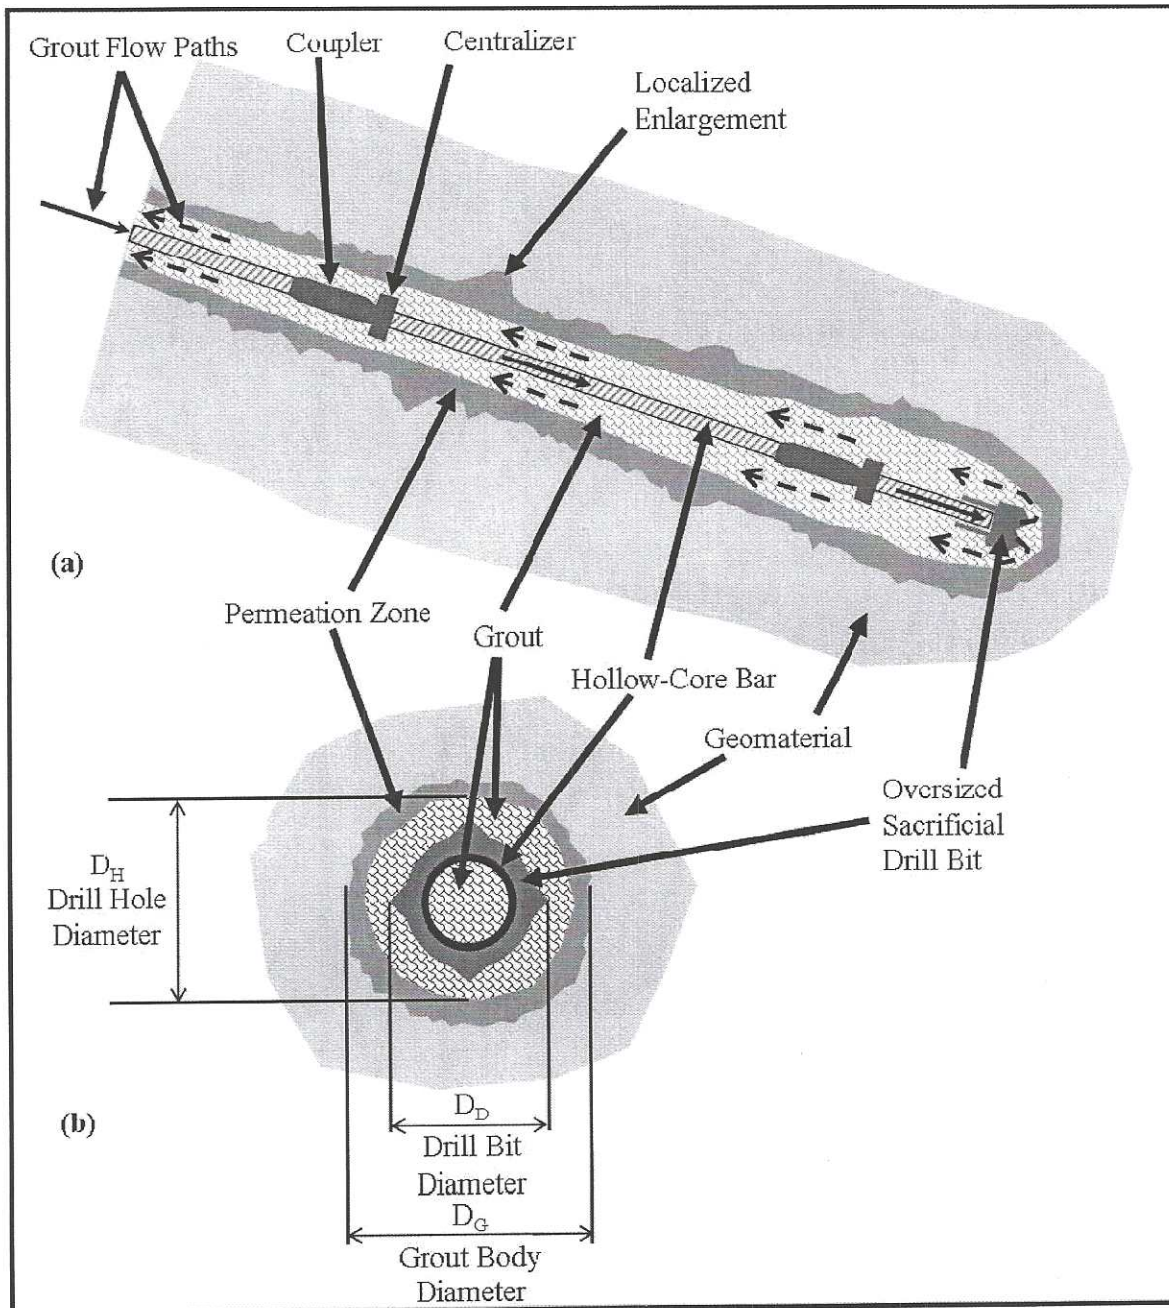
(a) Schematic of hollow-core soil nail installation and grout paths, (b) Schematic of a cross-section of hollow-core soil nail and the grout body.
